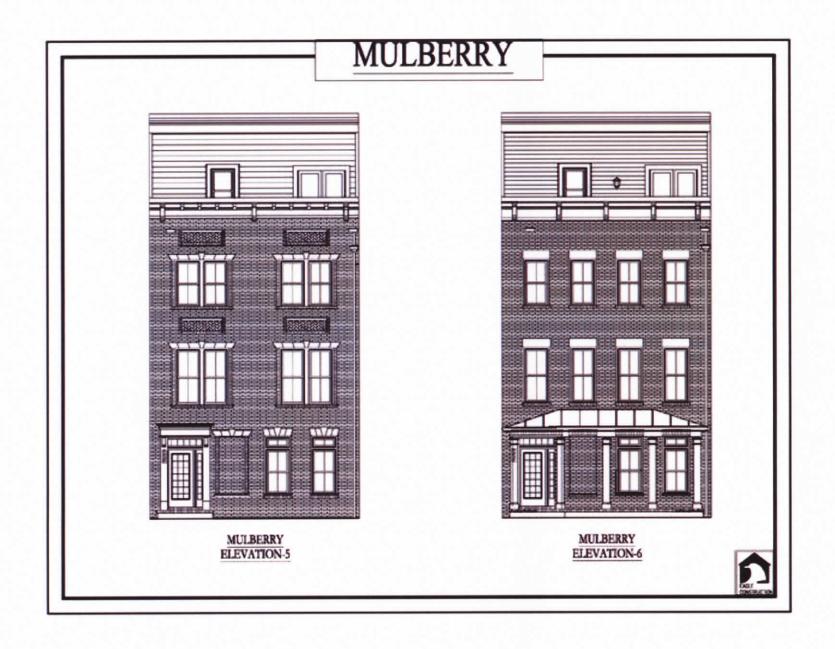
EXHIBIT C – PAGE 6 PARCEL 1 - PROPOSED CONDOMINIMUM & TOWNHOME ELEVATIONS
